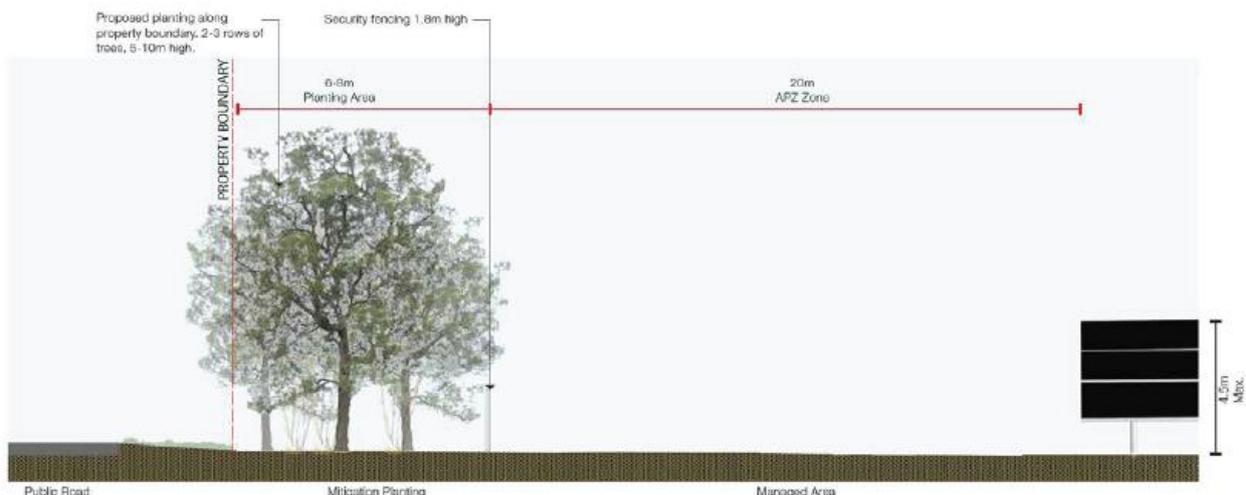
Typical section of proposed screen planting (Moir Landscapes, 2020).
